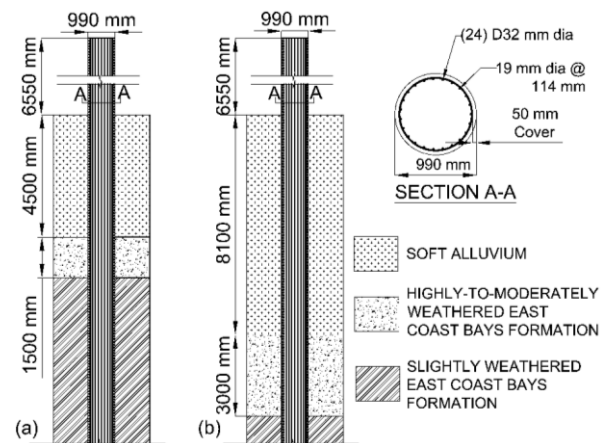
Soil profile characteristics, pile-column dimensions and pile-column cross sectional details for: (a) Specimen 1; and (b) Specimen 2.
